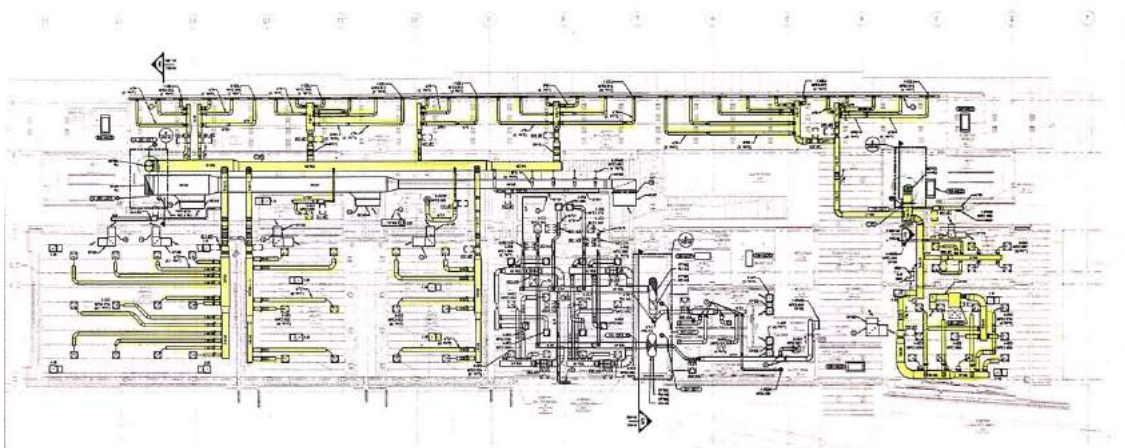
AHU3 system – First floor (Source: Architectural plans)
